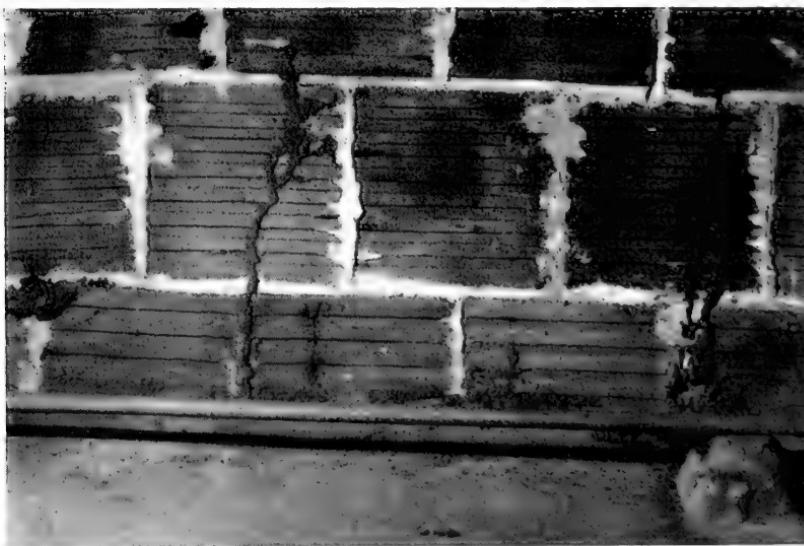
Termite tubes extending from the expansion joint between wall and basement floor. The tubes lead to a crack in the wall where termites were able to find a void and continue to wood without being exposed to view.
